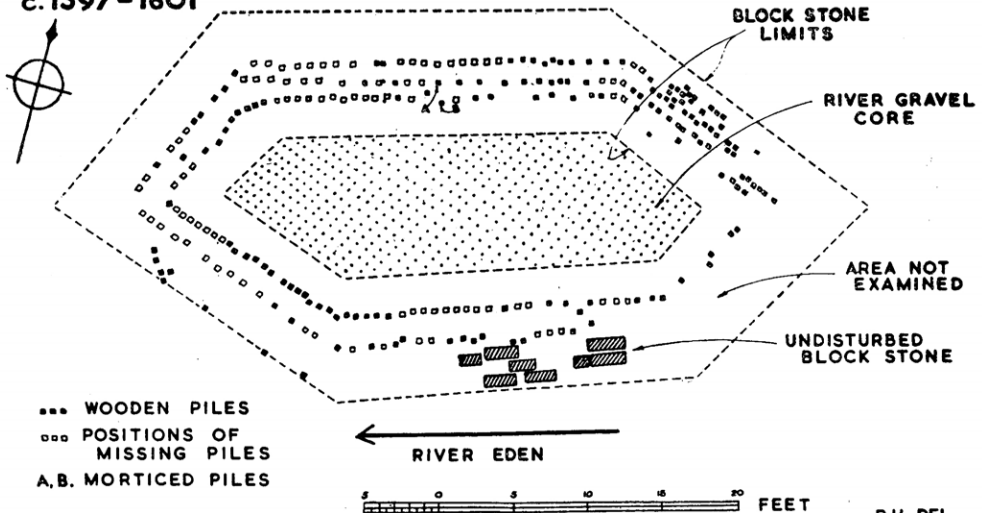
Plan of mid-water pier of the 16th century wooden Priestbeck Bridge, Stanwix, Carlisle.
